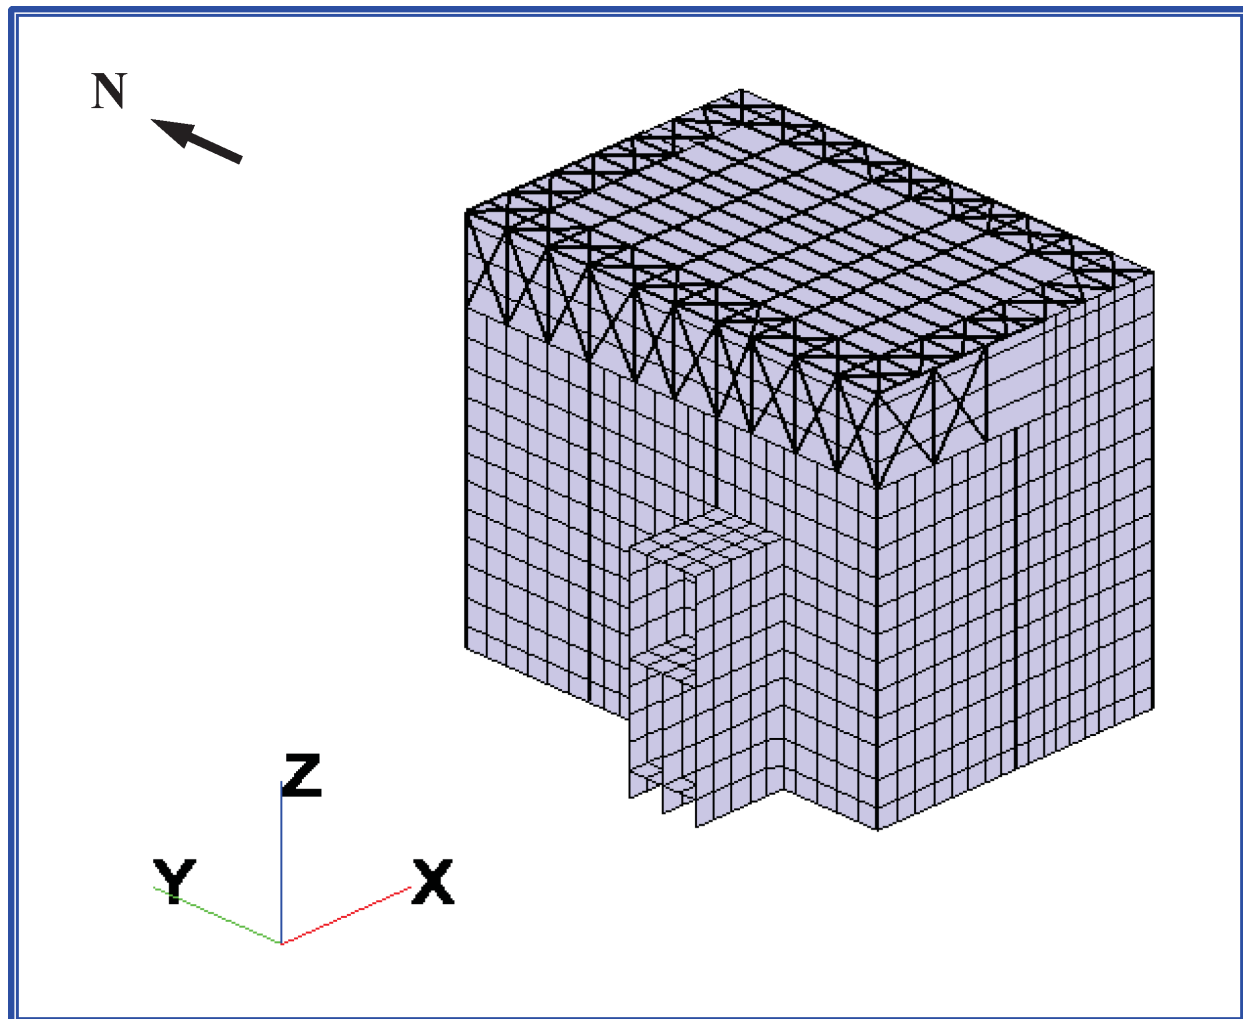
Control Building SASSI2010 Model Beam Elements
